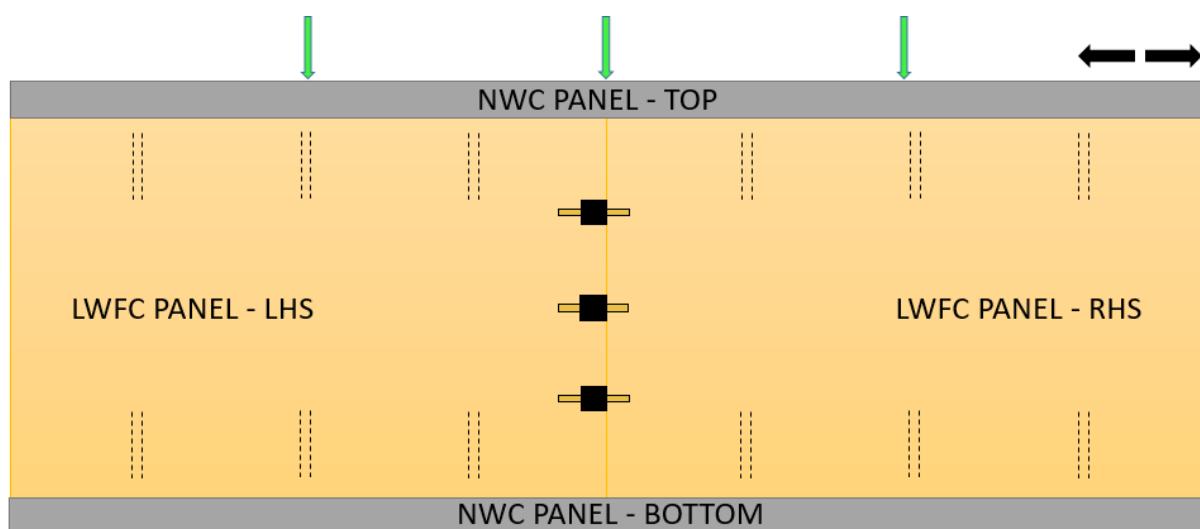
Physical scale test 2 showing cyclic load and connection placement. Three vertical connection boxes and six horizontal grouted rebar per LWFC panel are indicated.
